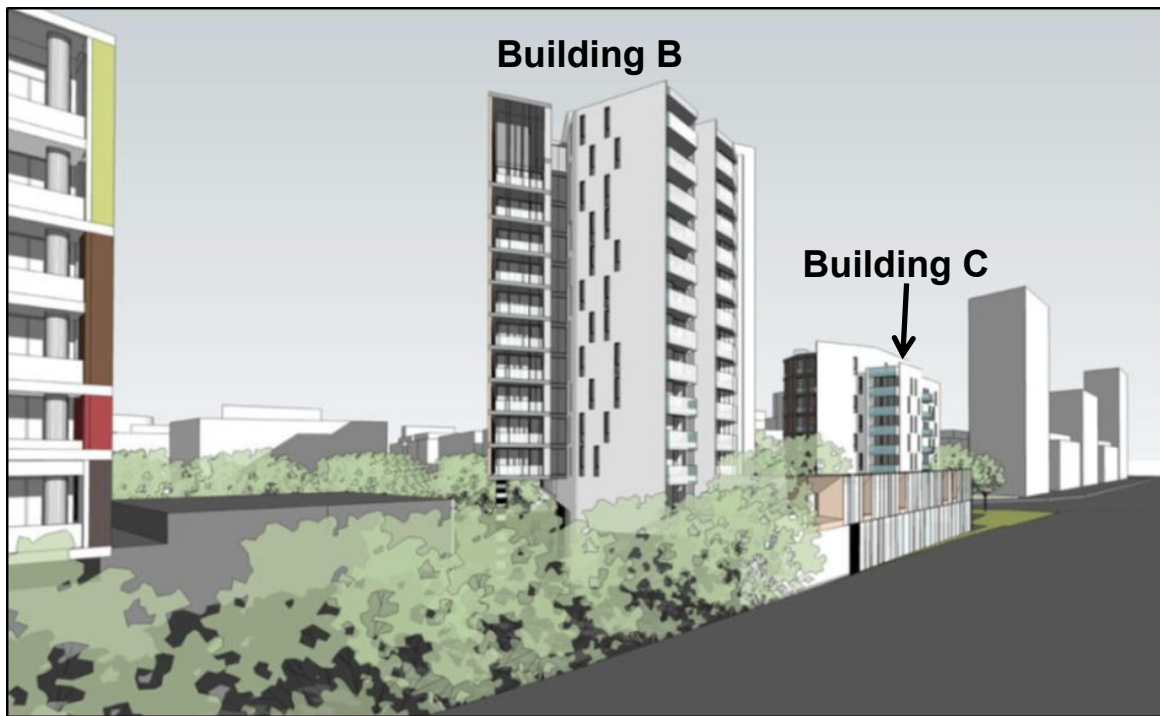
Perspective drawing of the proposed development as viewed from South Dowling Street/Southern Cross Drive overpass (looking north)
